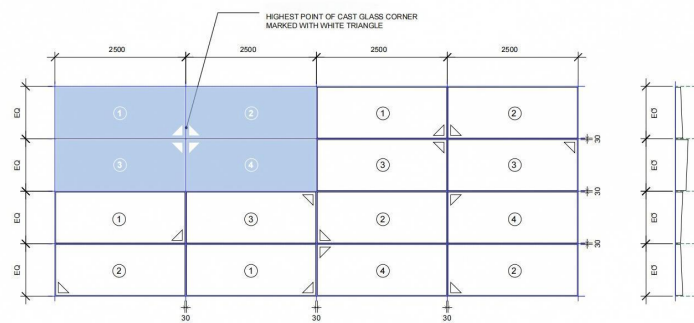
Layout of LIULI Composite Curtain Wall Unit Panels
